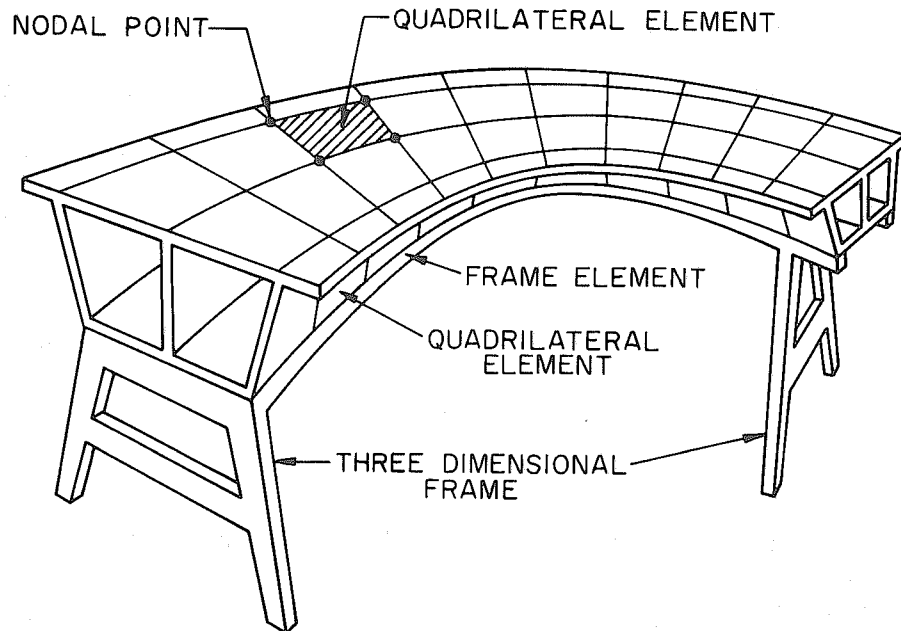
FINITE ELEMENT REPRESENTATION OF GENERAL BOX GIRDER BRIDGE
